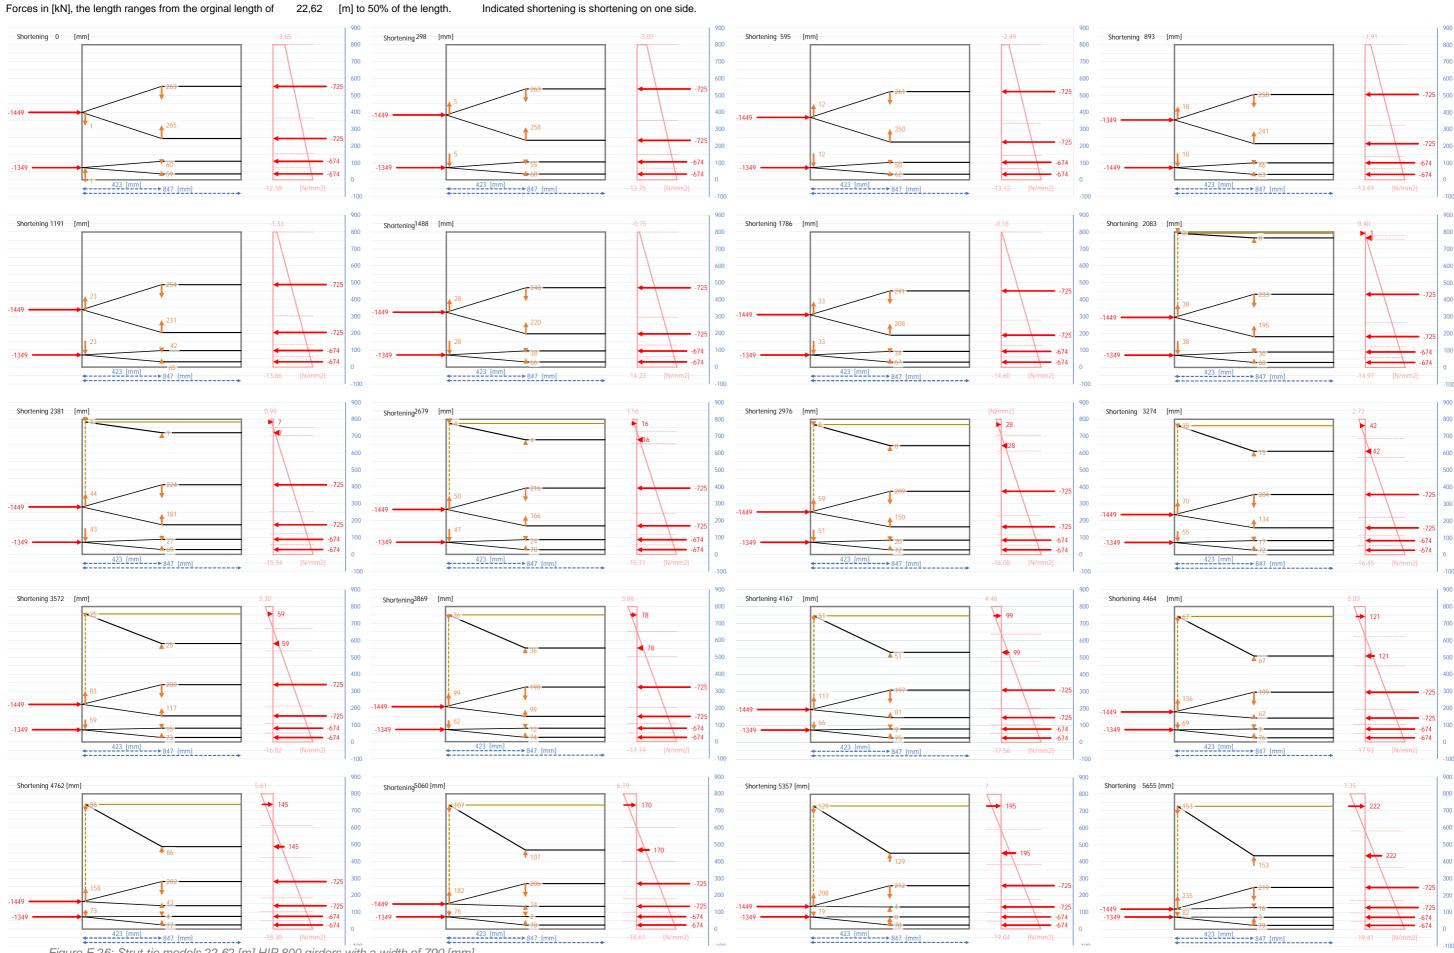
Strut-tie models 22,62 [m] HIP 800 girders with a width of 790 [mm].
